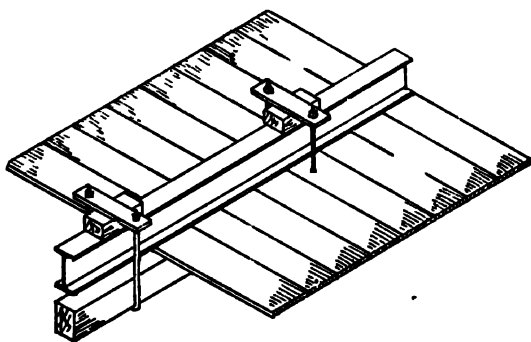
SUSPENDED CENTERING TO CONCRETE FLOOR
